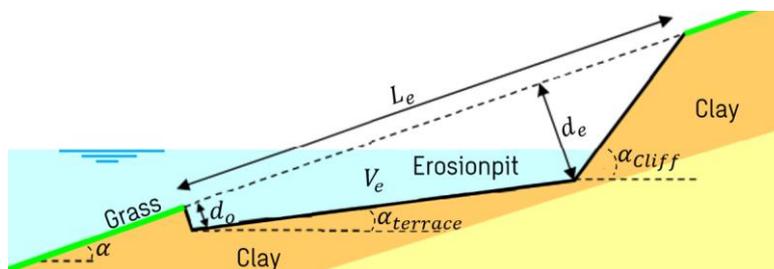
Erosion profile with dimensions (adapted from van Steijn & Klein Breteler (2021))
